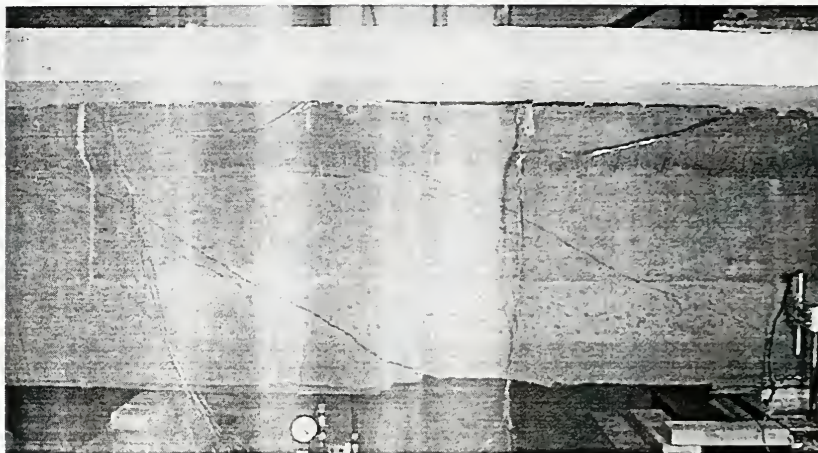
Web-Shear Cracks in North Shear Span, Specimen PC10S
